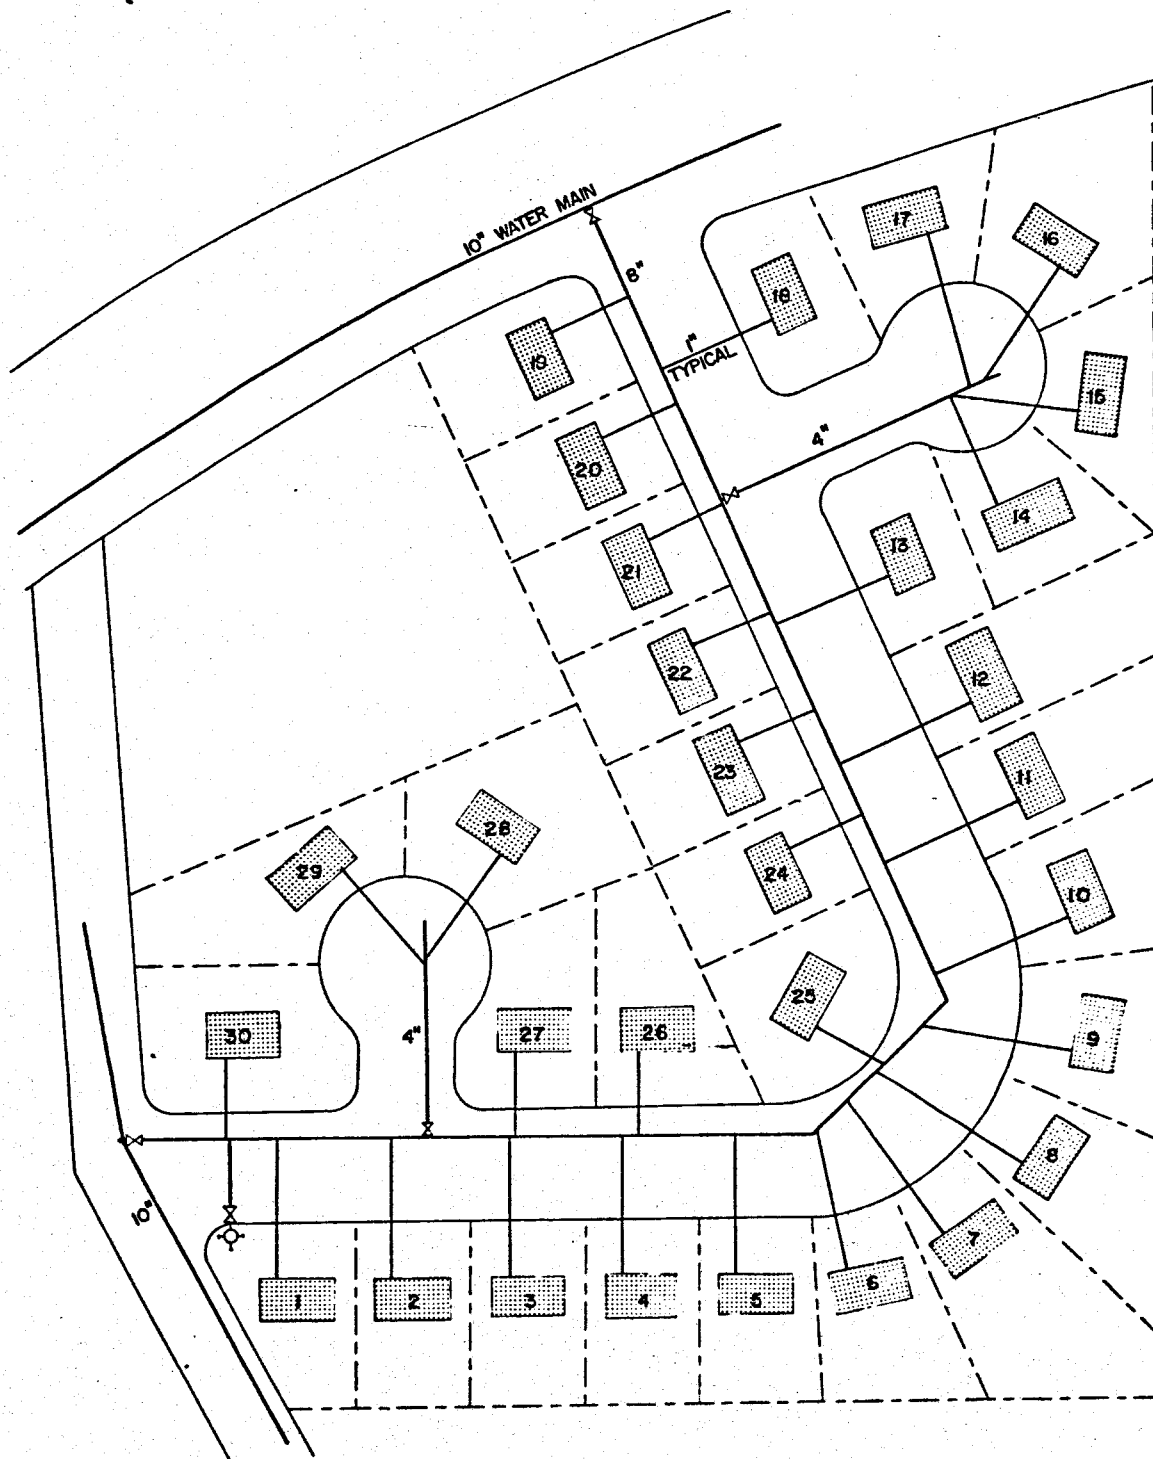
LAYOUT OF SUNRISE ADDITION SUBDIVISION WITH EXISTING POTABLE WATER PIPING
